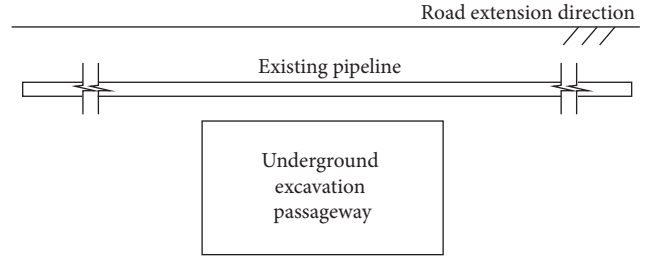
Locations of the underground excavation project and existing pipeline.
